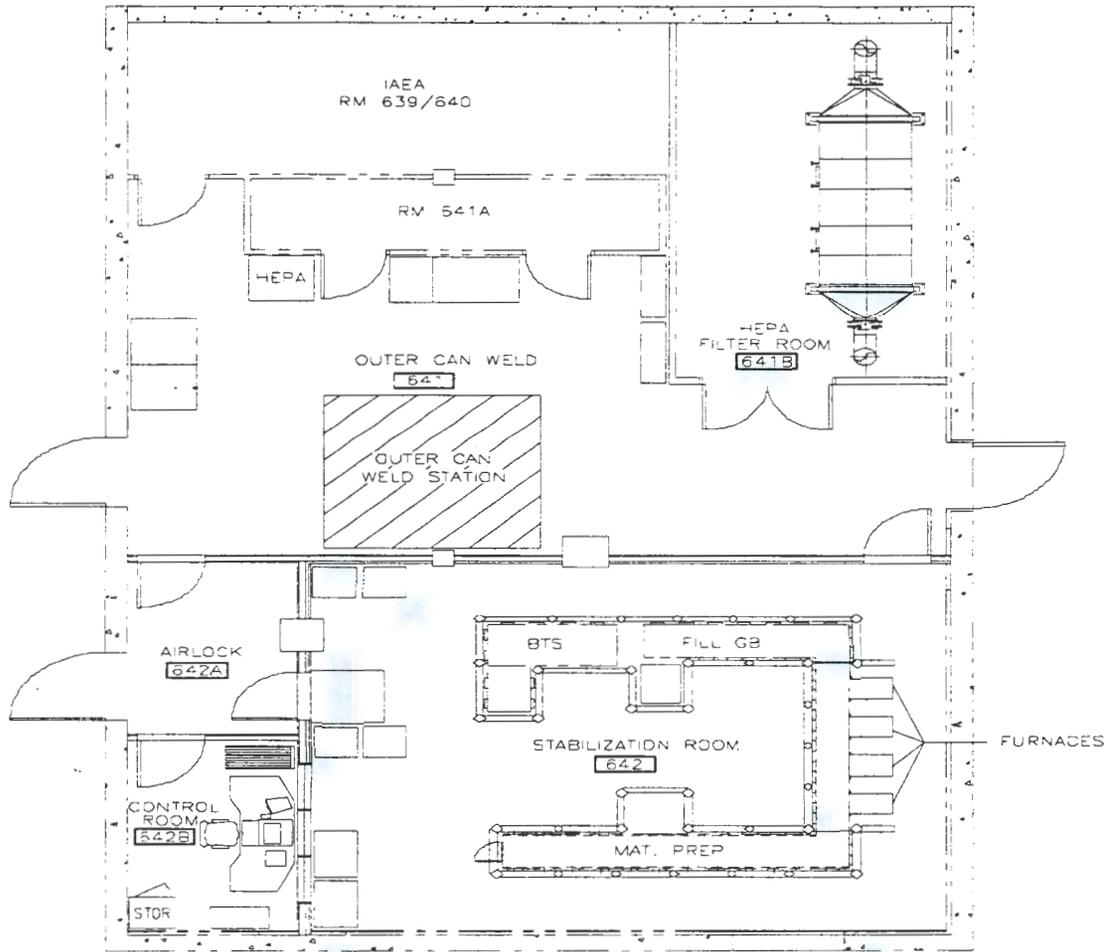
2736-ZB Building, Rooms 641/642 Layout.
